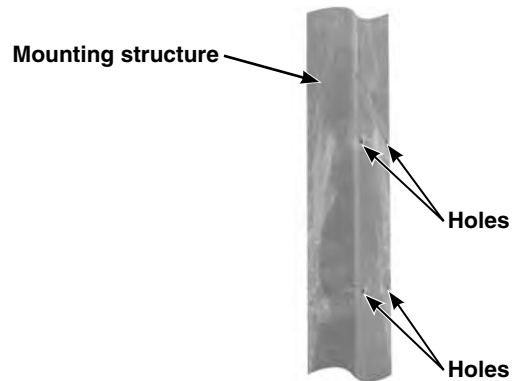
Drill four holes in the structure where the low-voltage connection enclosure will be mounted.
